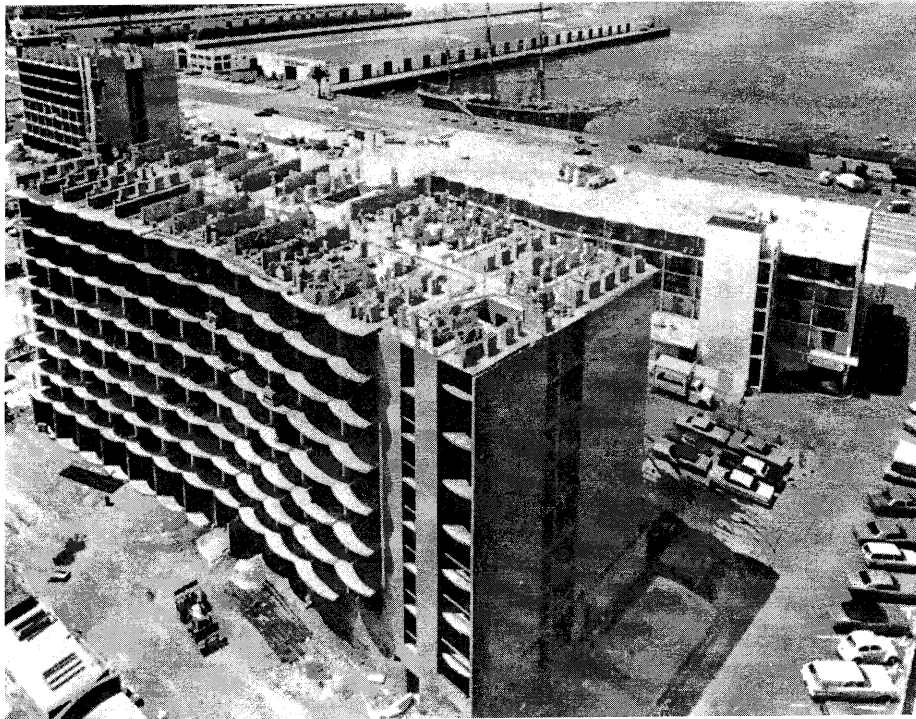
Construction of a high-rise motel using reinforced concrete masonry walls. (Courtesy of Portland Cement Association)
